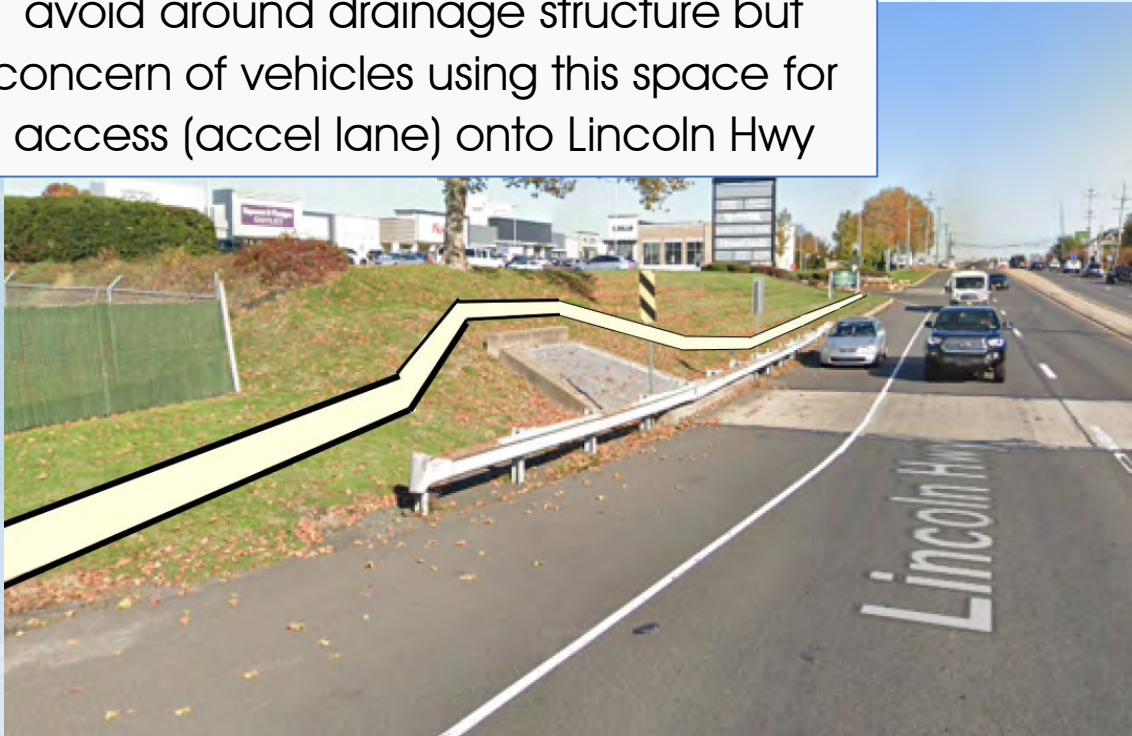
Business Route 1 WB looking towards drainage structure and challenging topography
